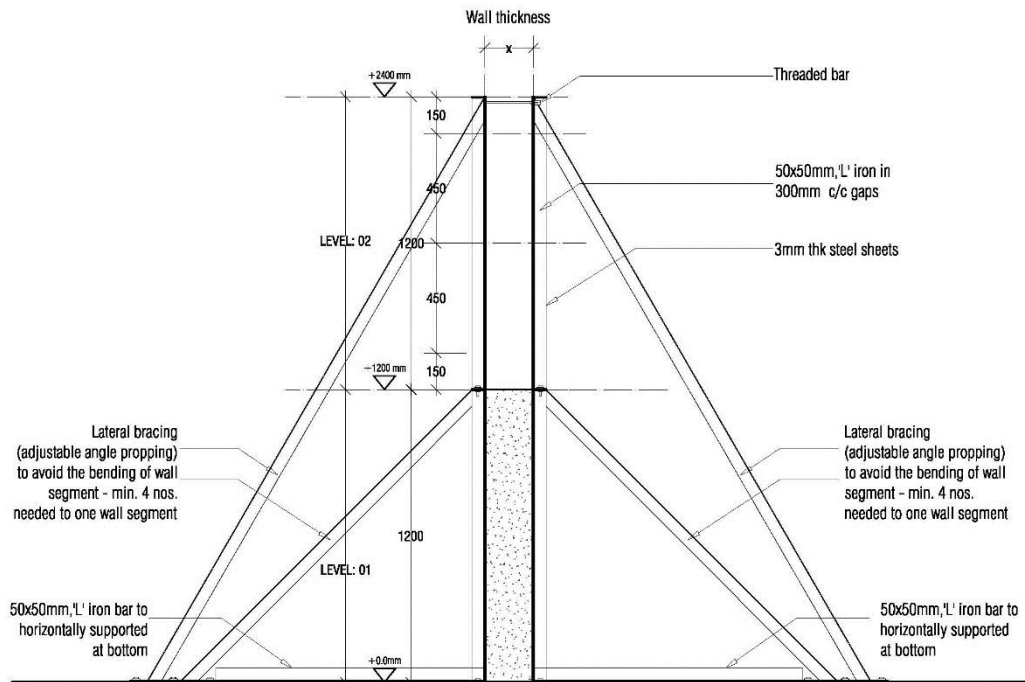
Formwork arrangement to typical wall segment – SIDE ELEVATION
